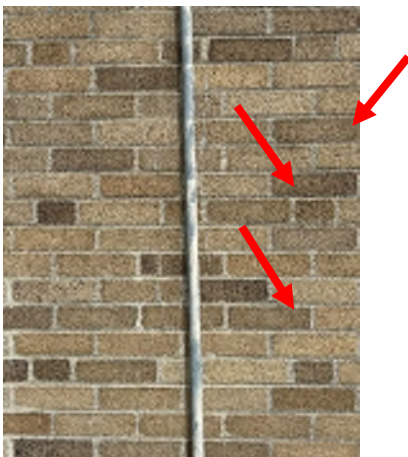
View of vertical cracks in the brick masonry wall on both sides of the conduit.
